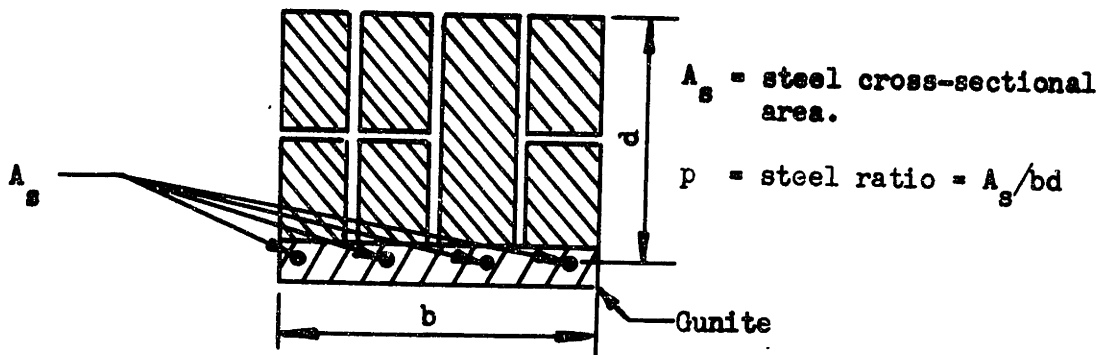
Cross-Sectional View of Typical Reinforced Gunited Masonry Section
